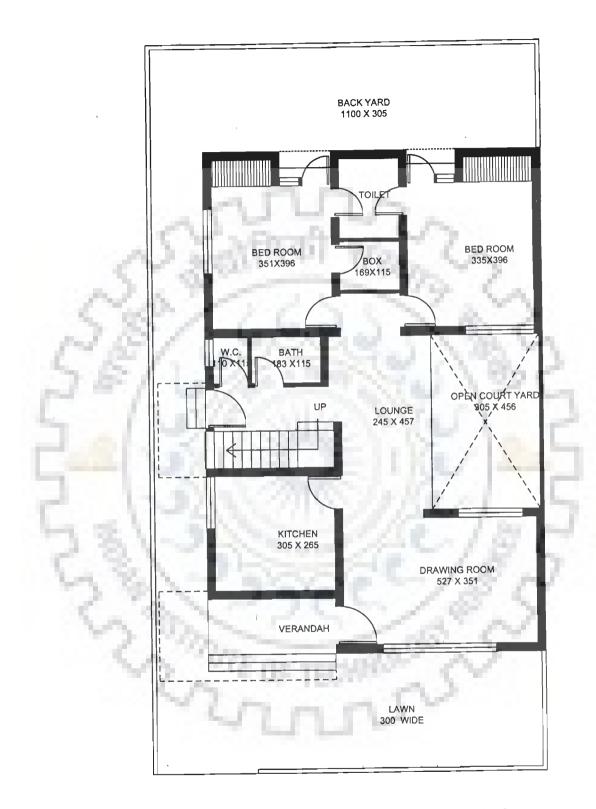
(a) - Ground Floor Plan of Project No. 8 (Plinth Area = 126.13 sqm; Floor Area = 104.68 sqm)
